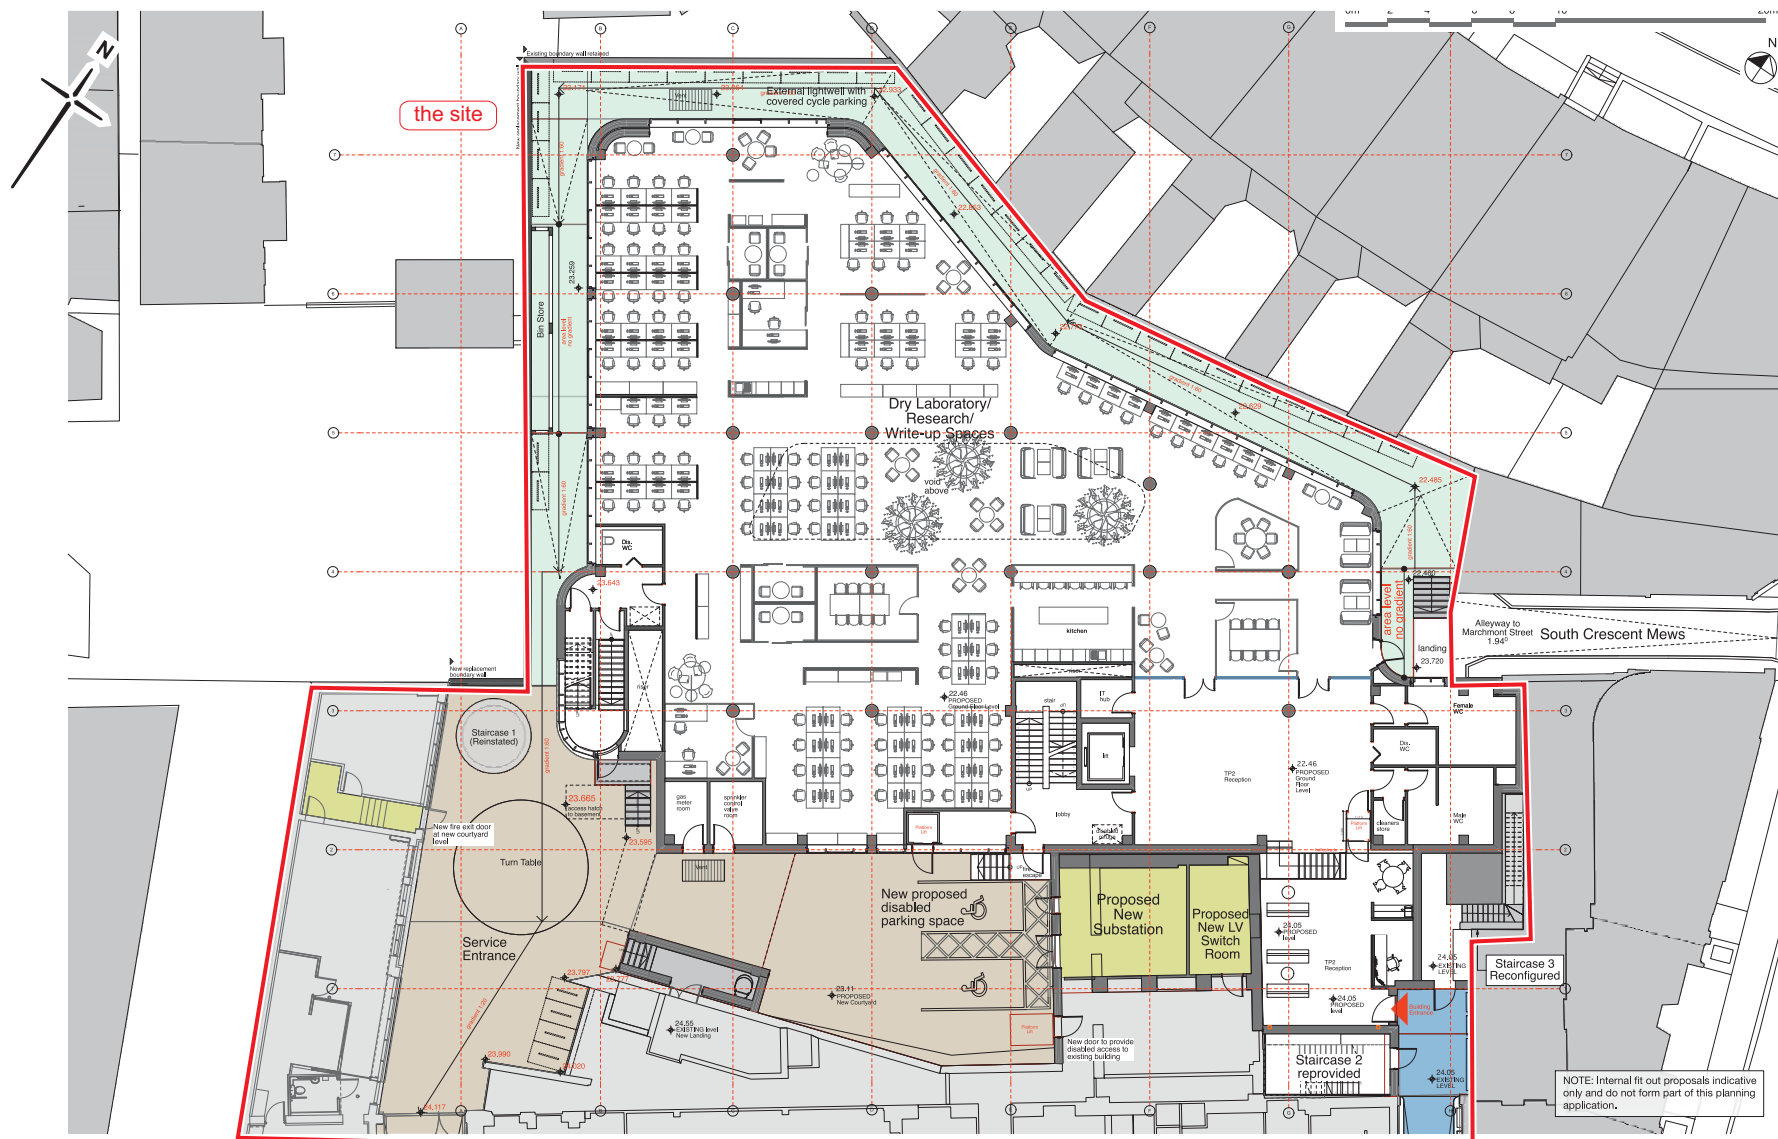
Plan of proposed ground floor (BMJ Architects, Drwg No 2924/AW10 PL(00)23, October 2017, Rev D)
